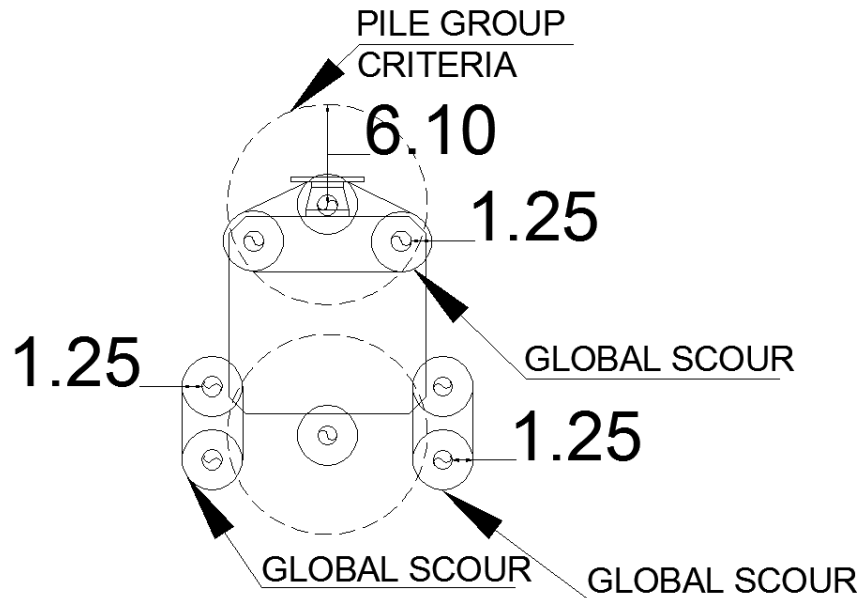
Berthing Dolphin Pile Projection (dimensions in meters)
